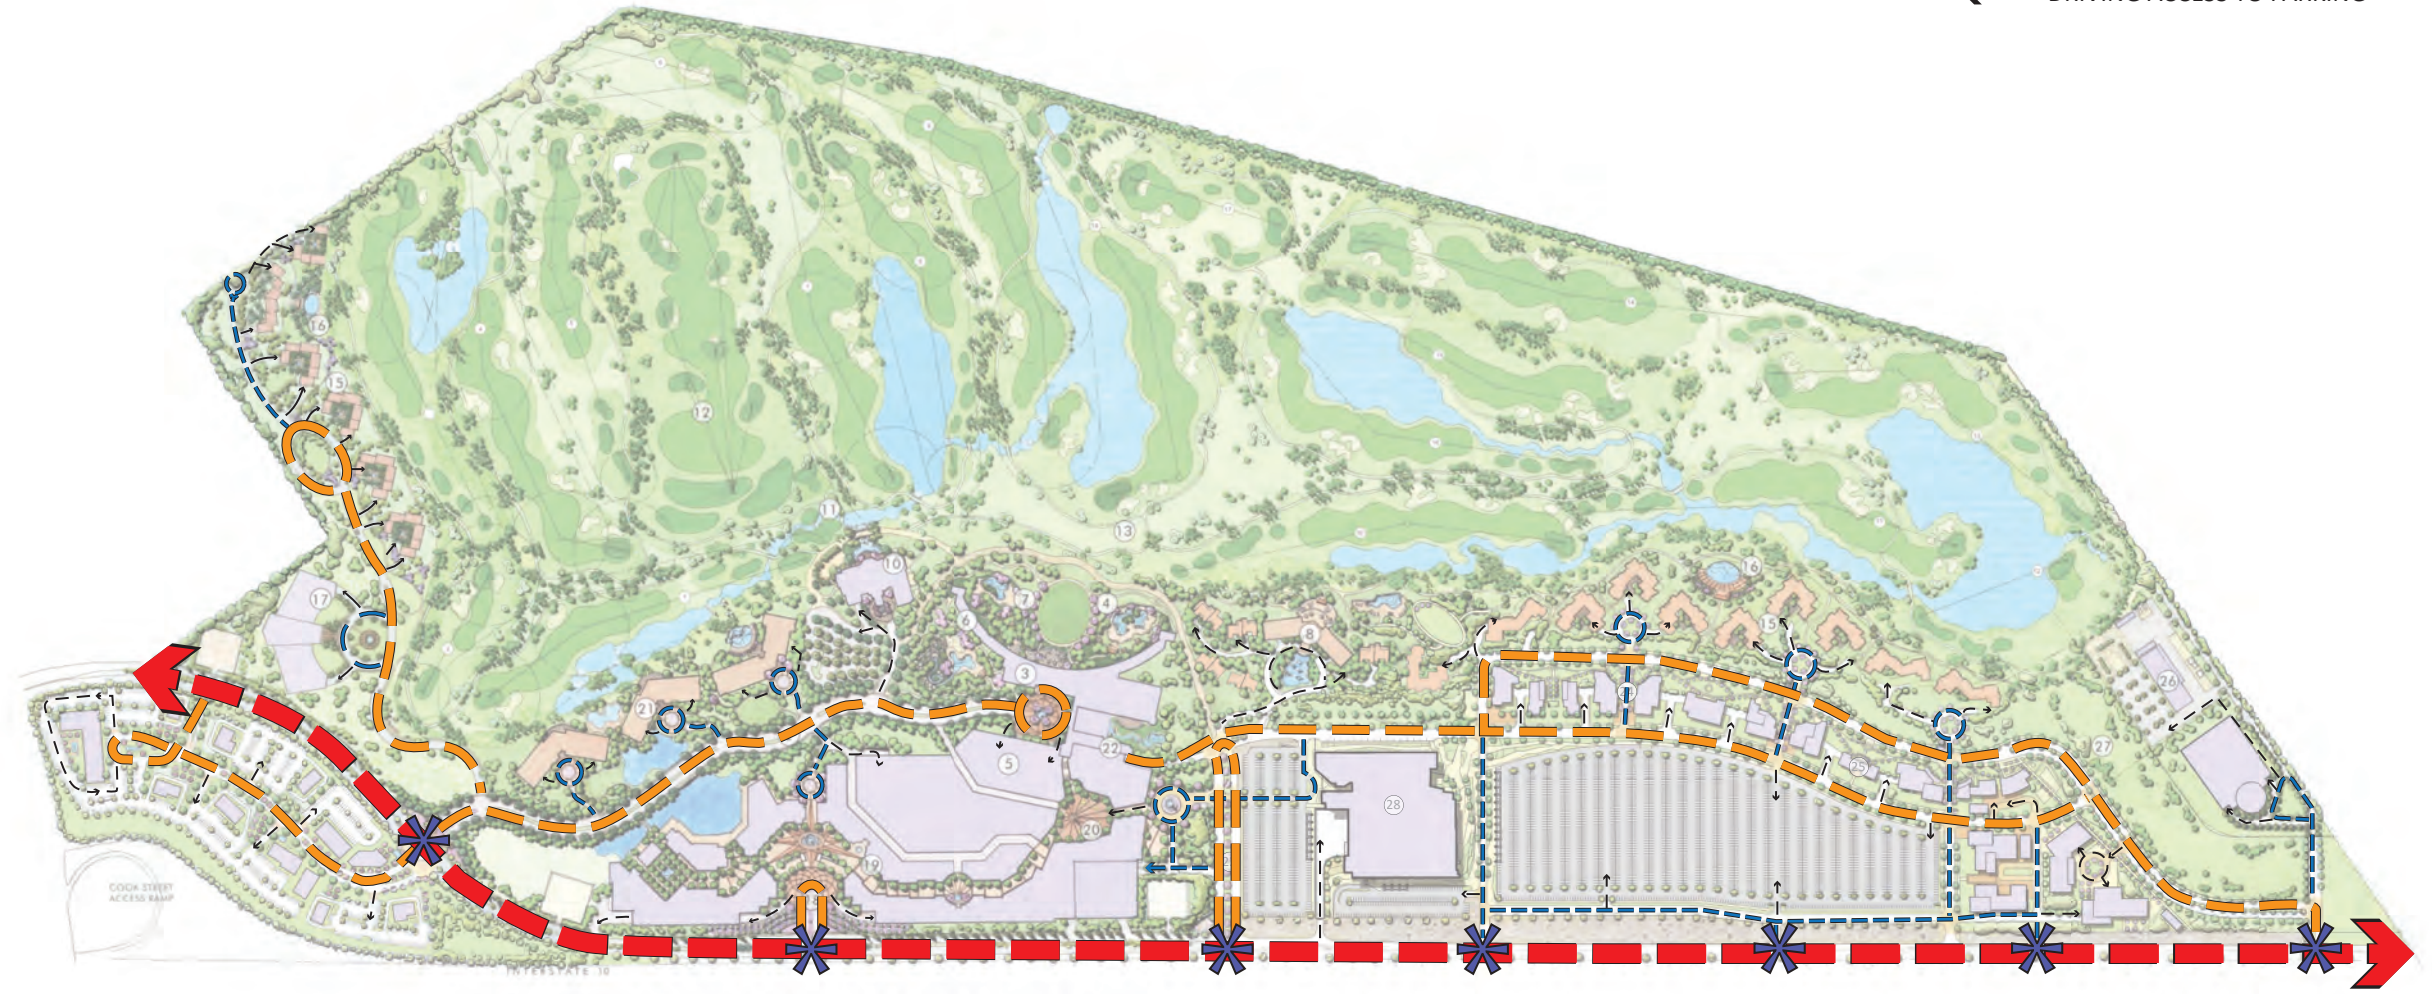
, Conceptual Vehicular Plan, illustrates the street system for the proposed project. Access into the site is provided via Varner Road which is situated parallel to both the southern boundary of the project site and the northern boundary of Interstate 10. Varner Road intersects Cook Street (immediately west of the property) and Washington Street (approximately three miles to the east). The County of Riverside designates Varner Road as a Major Highway (118' right of way). Although depicted in the Riverside County General Plan as a Secondary Highway (100' right of way), the Varner Road cross section parallel to I-10 (Figure IV-4) has been modified by the Riverside County Transportation department staff to accommodate projected growth associated with the project site and surrounding area. Said portion of Varner Road will consist of the following:
